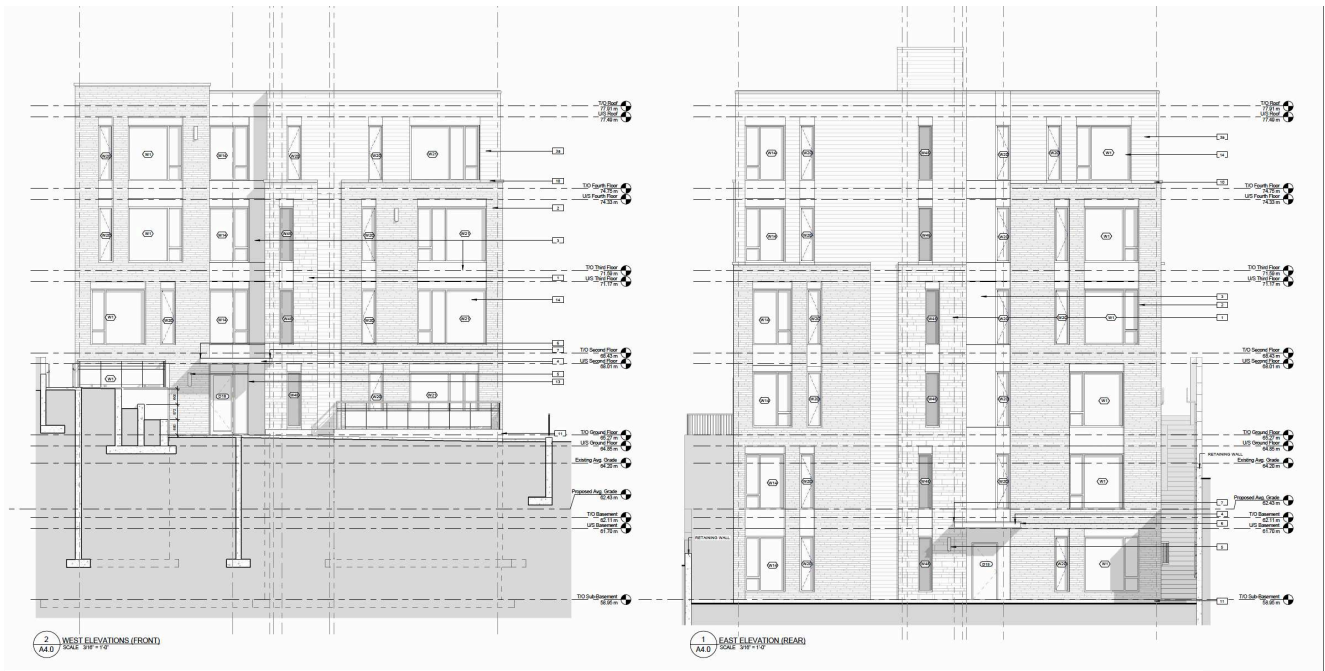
West & East 2D Elevations (Source: Lawrence Architects)
